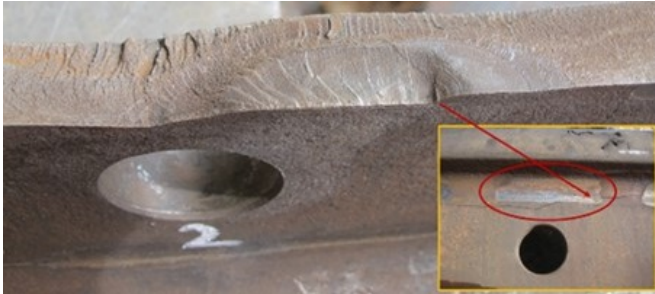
Fatigue crack initiation at casting support tab contact with the rail above bolt hole 2. Red oval around surface fatigue caused by bearing on the casting support tabs.
